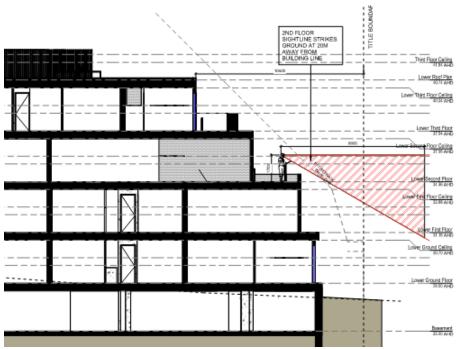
Sectional diagram demonstrating overlooking measures from second floor terrace, toward the rear
